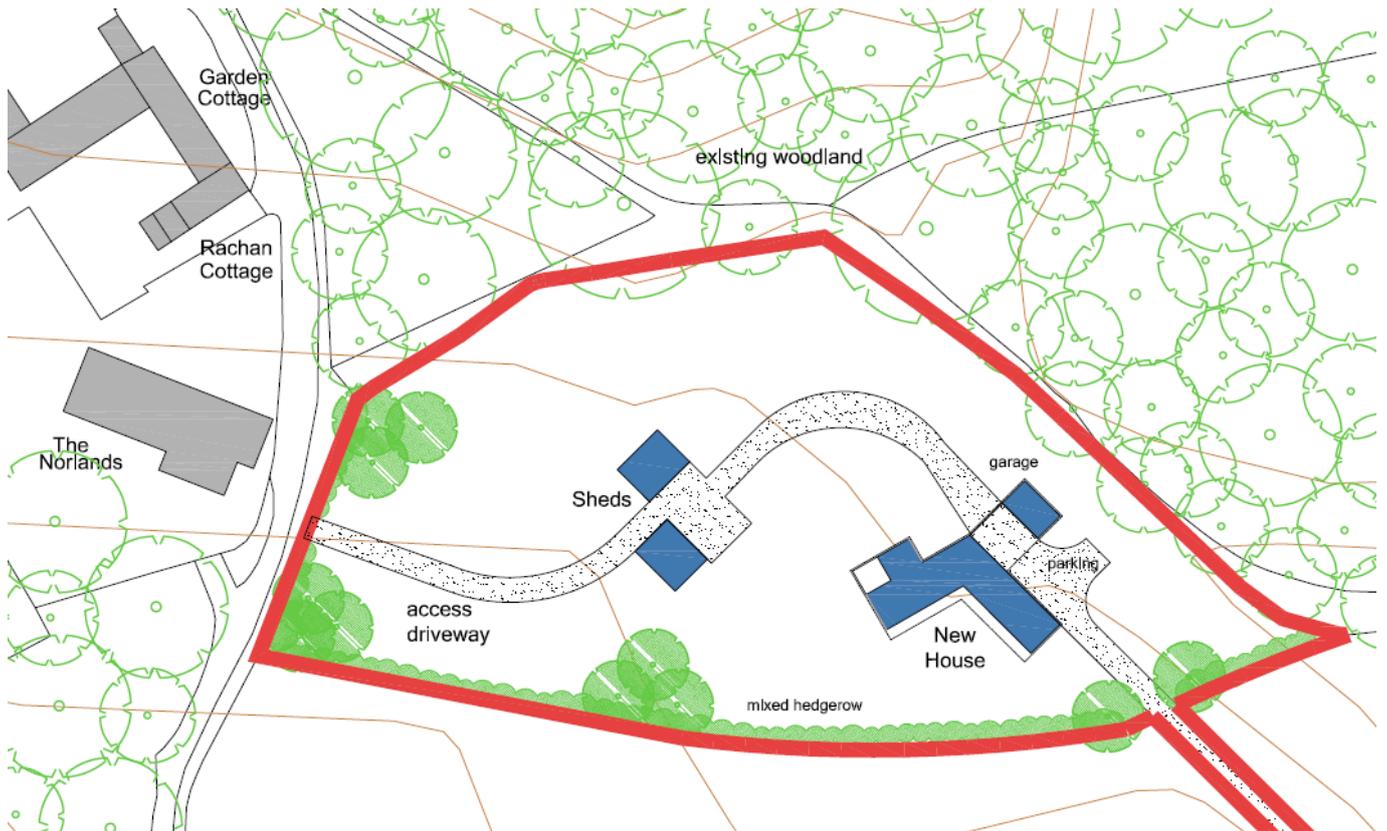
Extract from 20038-PPP-002-D Indicative Site Plan (Source: David Jane Architects).
